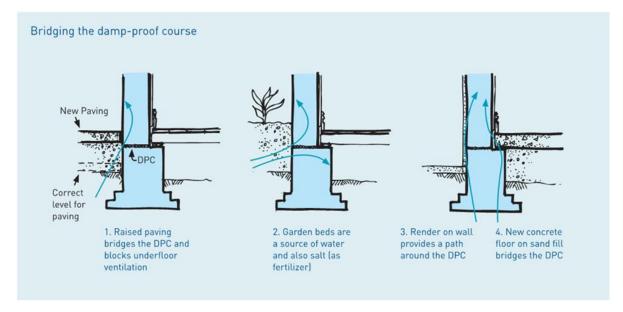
Bridging the damp-proof course. Four examples of how changes to a building can create a path, or bridge, around an existing damp-proof course. Bridging by build-up of paving or garden beds is a common cause of rising damp problems. See also Figures 29 and 49 for further examples of bridging.
